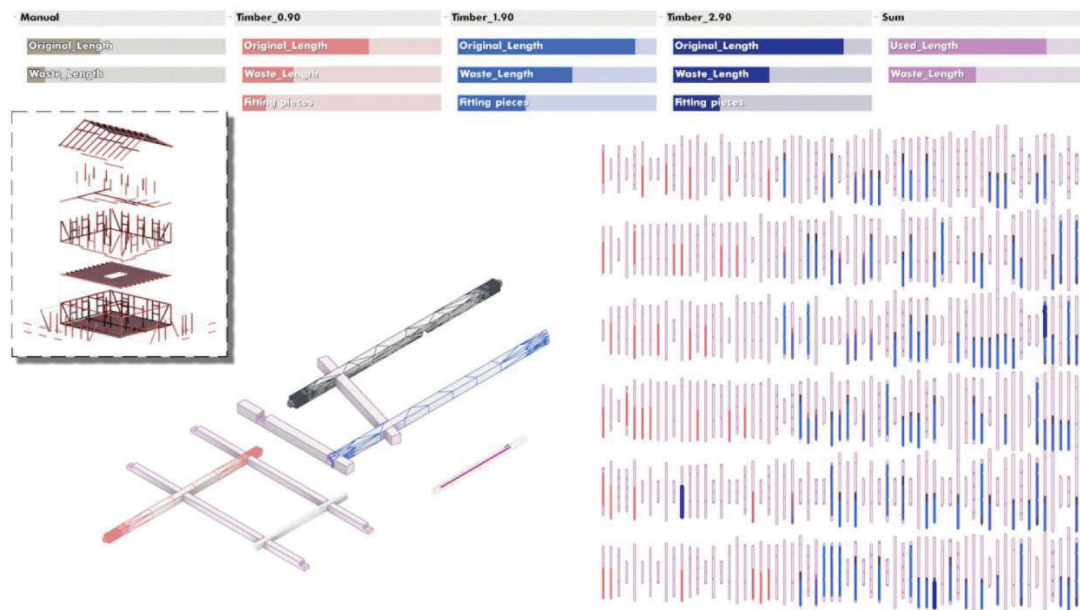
Matching reclaimed timber beams from timber barm elements for a newly designed structure
